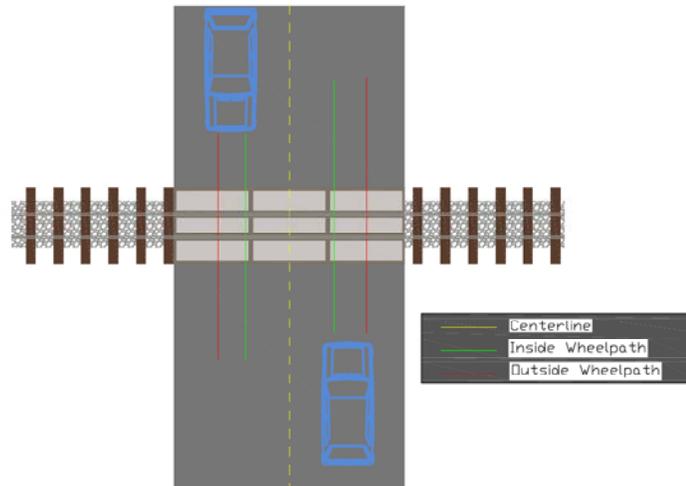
Plan View of Wheelpaths for Pavement Profiles
